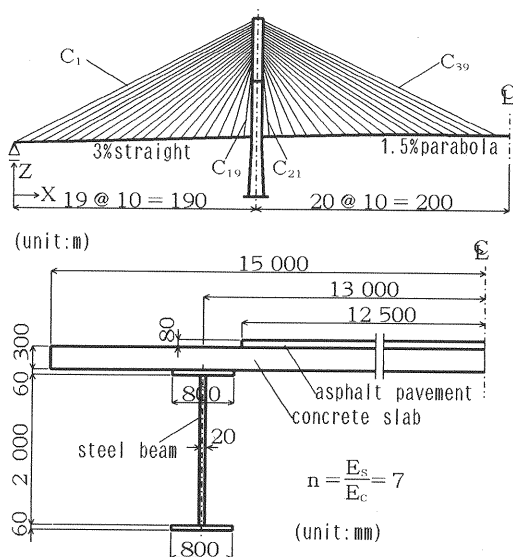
Cable-stayed bridge with two edge composite girders used as a calculation model
